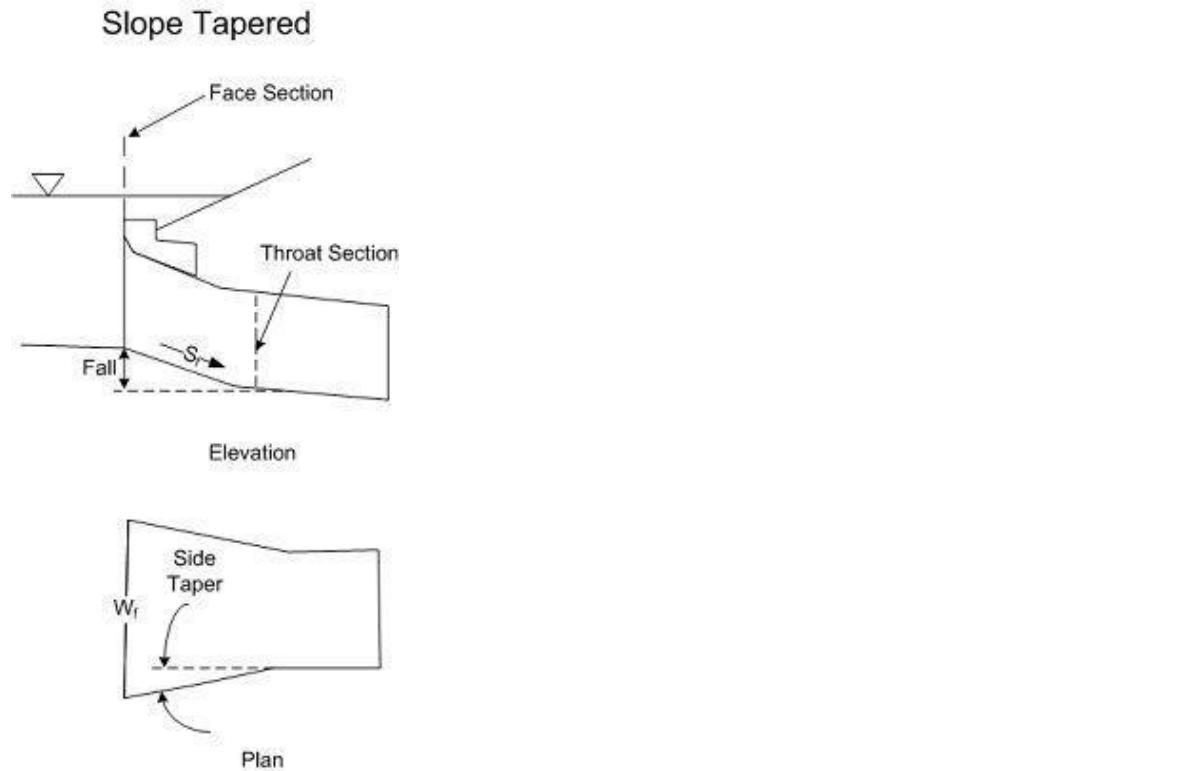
Definition sketch for a slope tapered culvert inlet.
